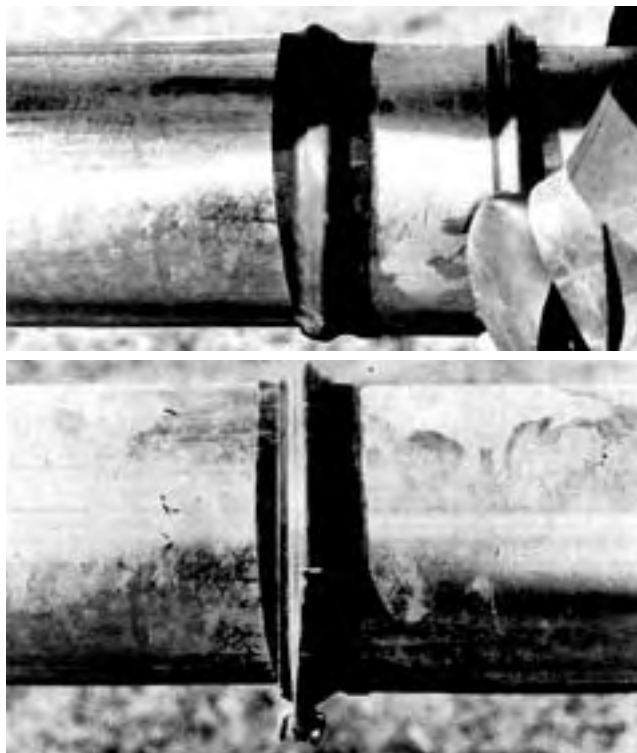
Pipe Connection (Upper: Rubber Seals over Joint, Lower: Clamp Placed over Rubber Seal.)
